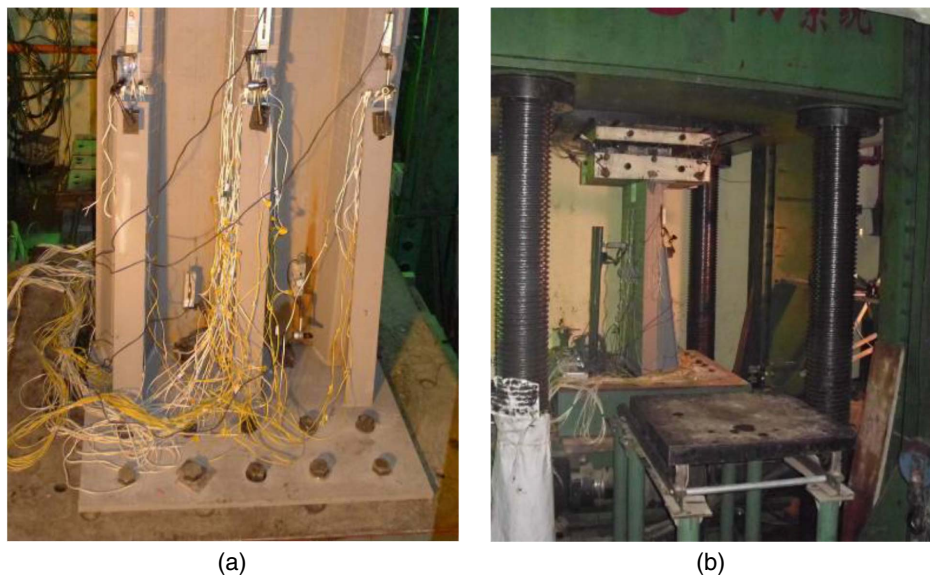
Test system: (a) anchorage bolts; and (b) testing device.
